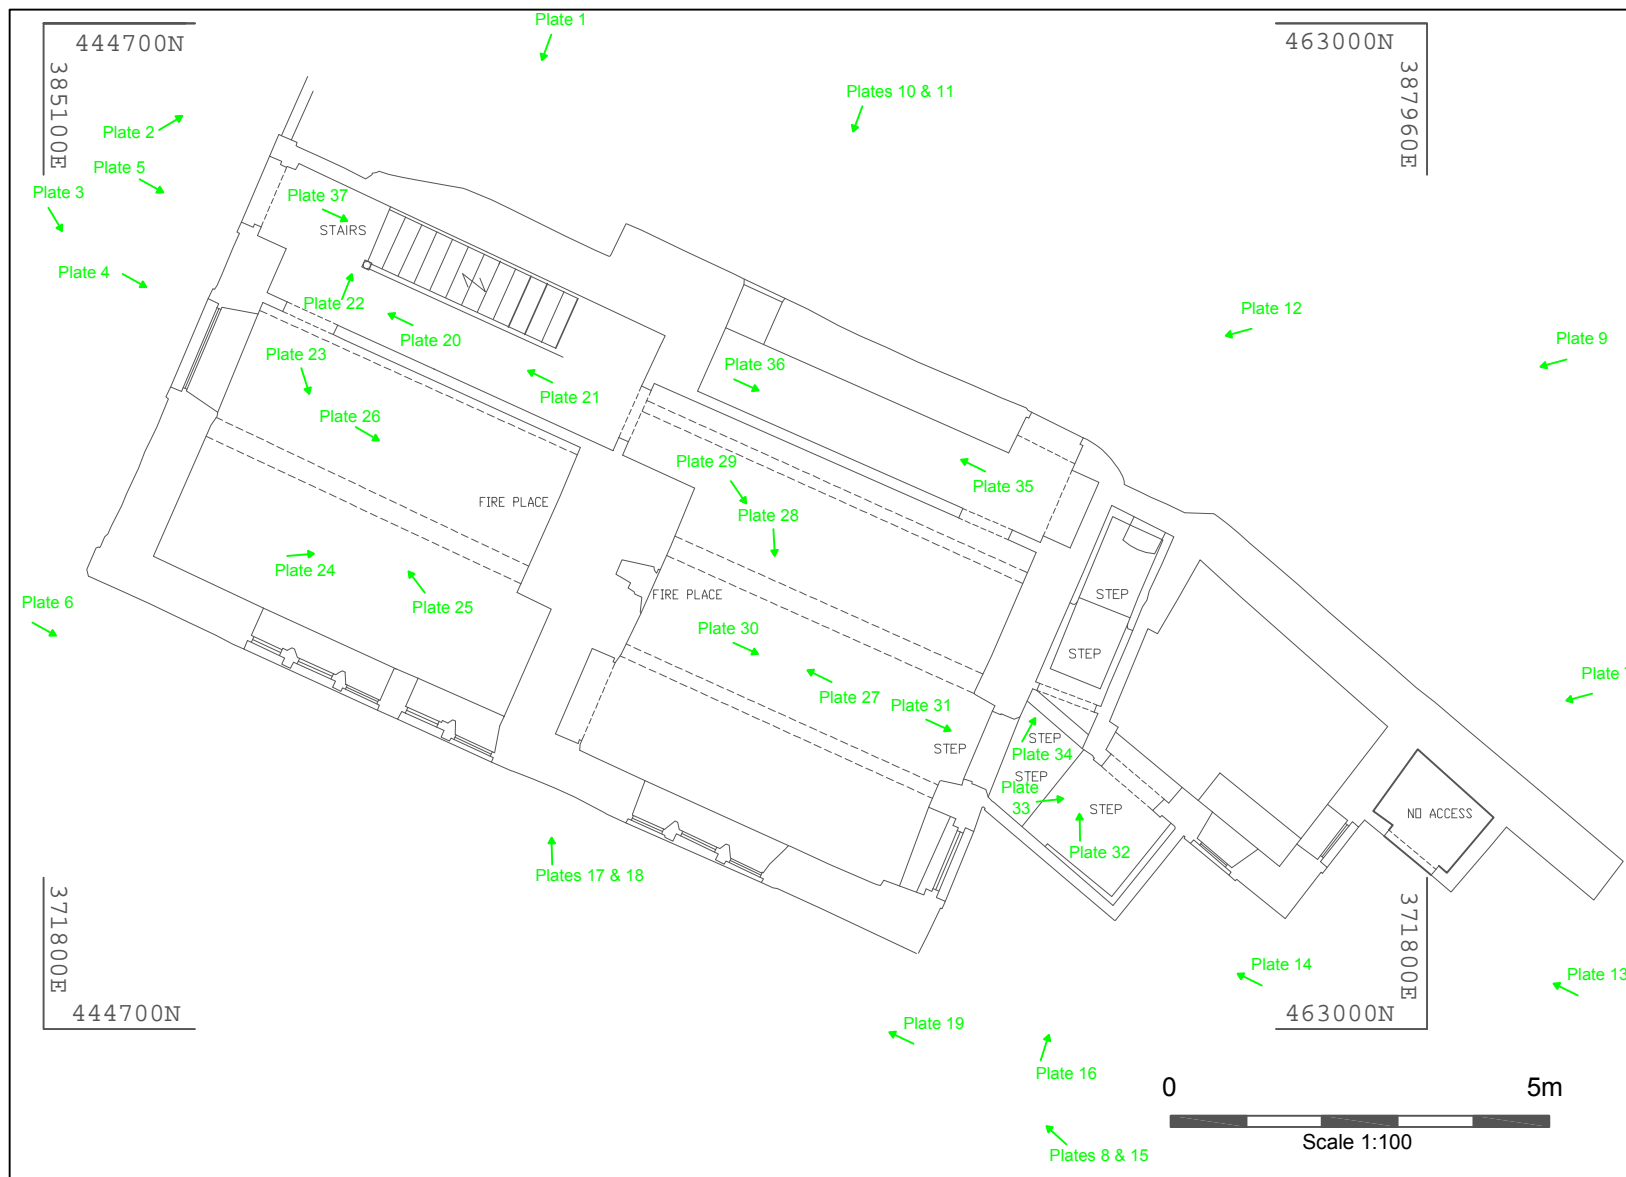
Marsden Park Cottage: Ground Floor Plan.
